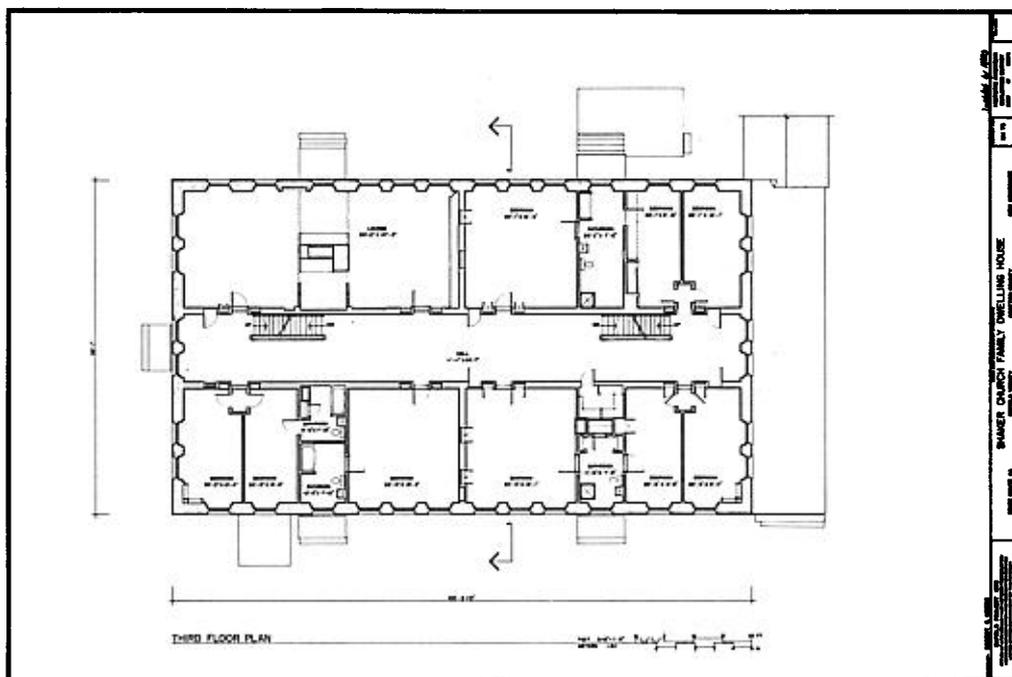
THE GREAT STONE DWELLING, THIRD FLOOR PLAN, 1978. Drawing by the Historic American Buildings Survey (unedited by HABS).
